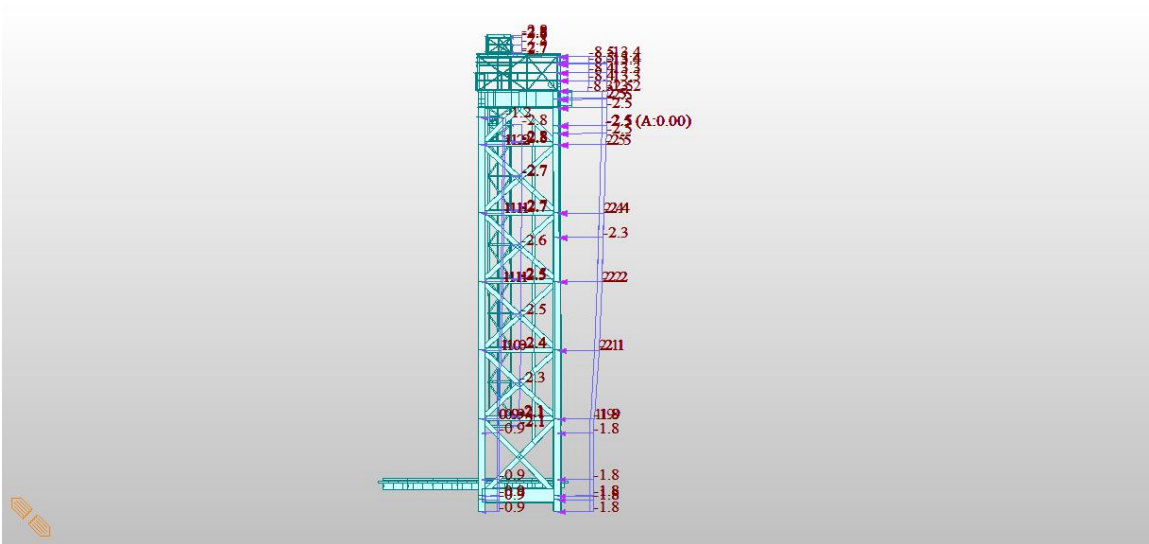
Wind Load Longitudinal 2 (North to South) – Tower
